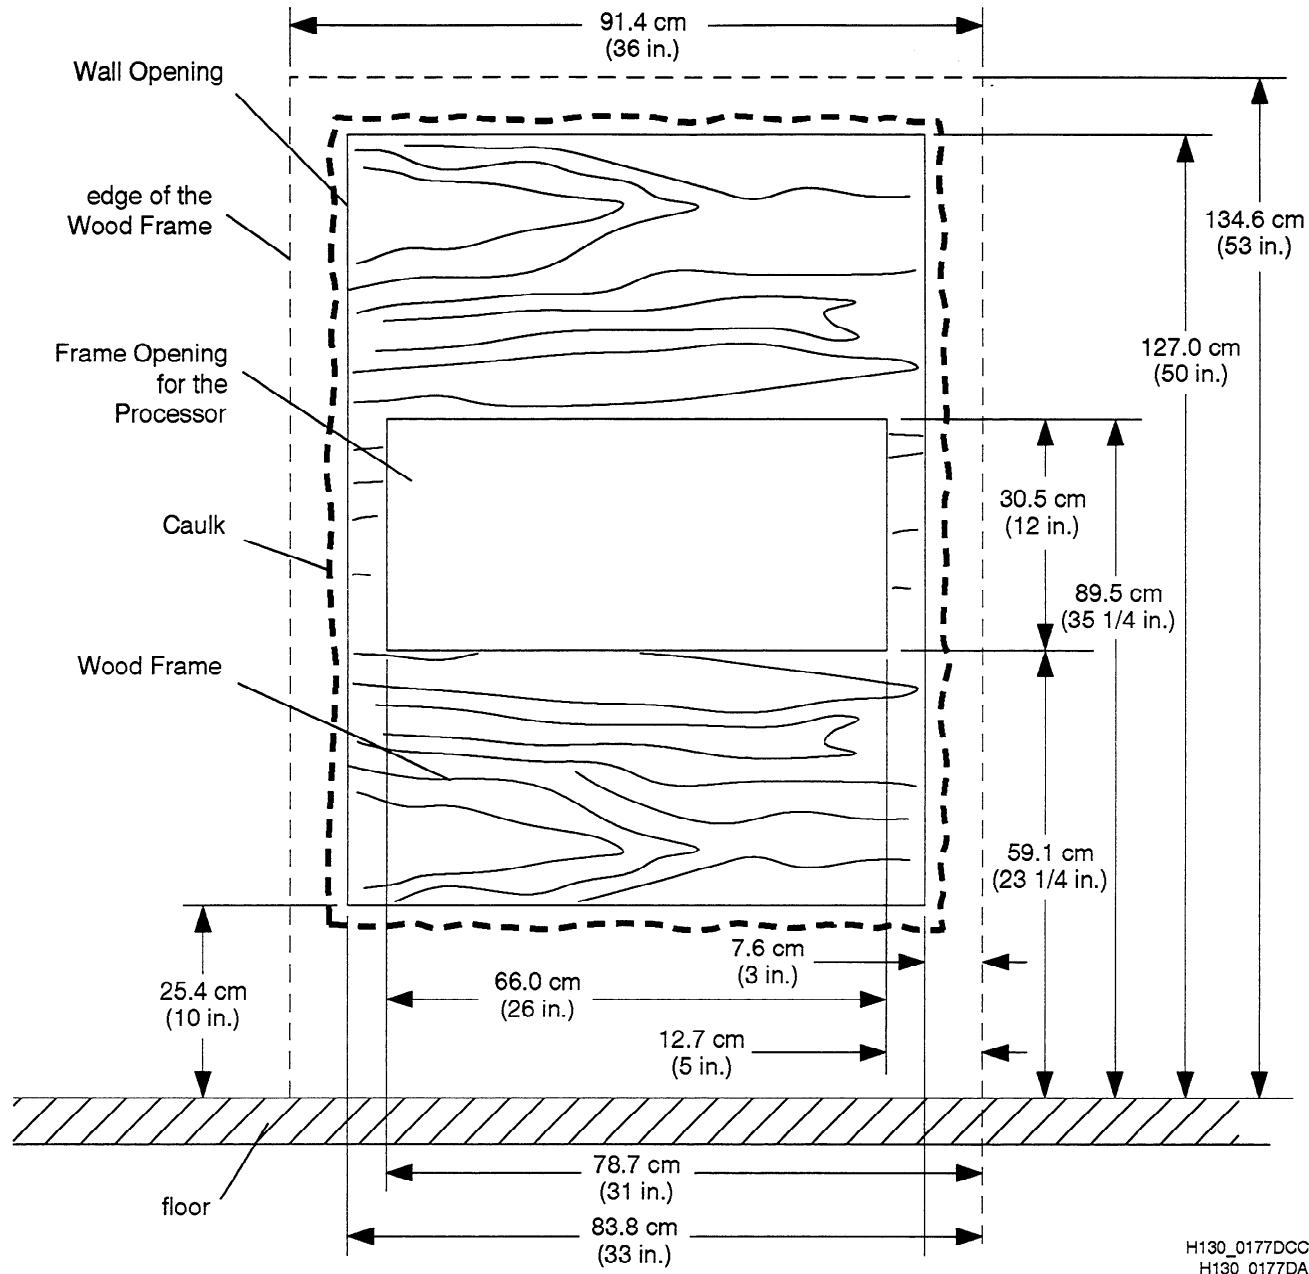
Suggested Room Layout for Through-the-Wall Installations
